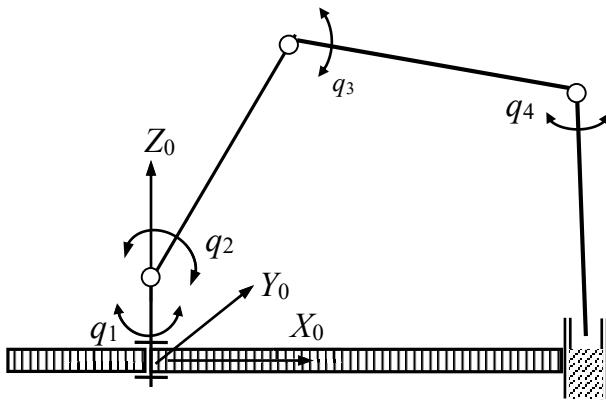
Structure of the articulated arm for concrete laying in the formwork
